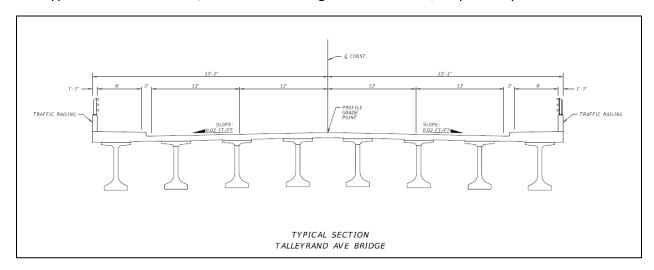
Bridge concept would maintain existing four-lane configuration
